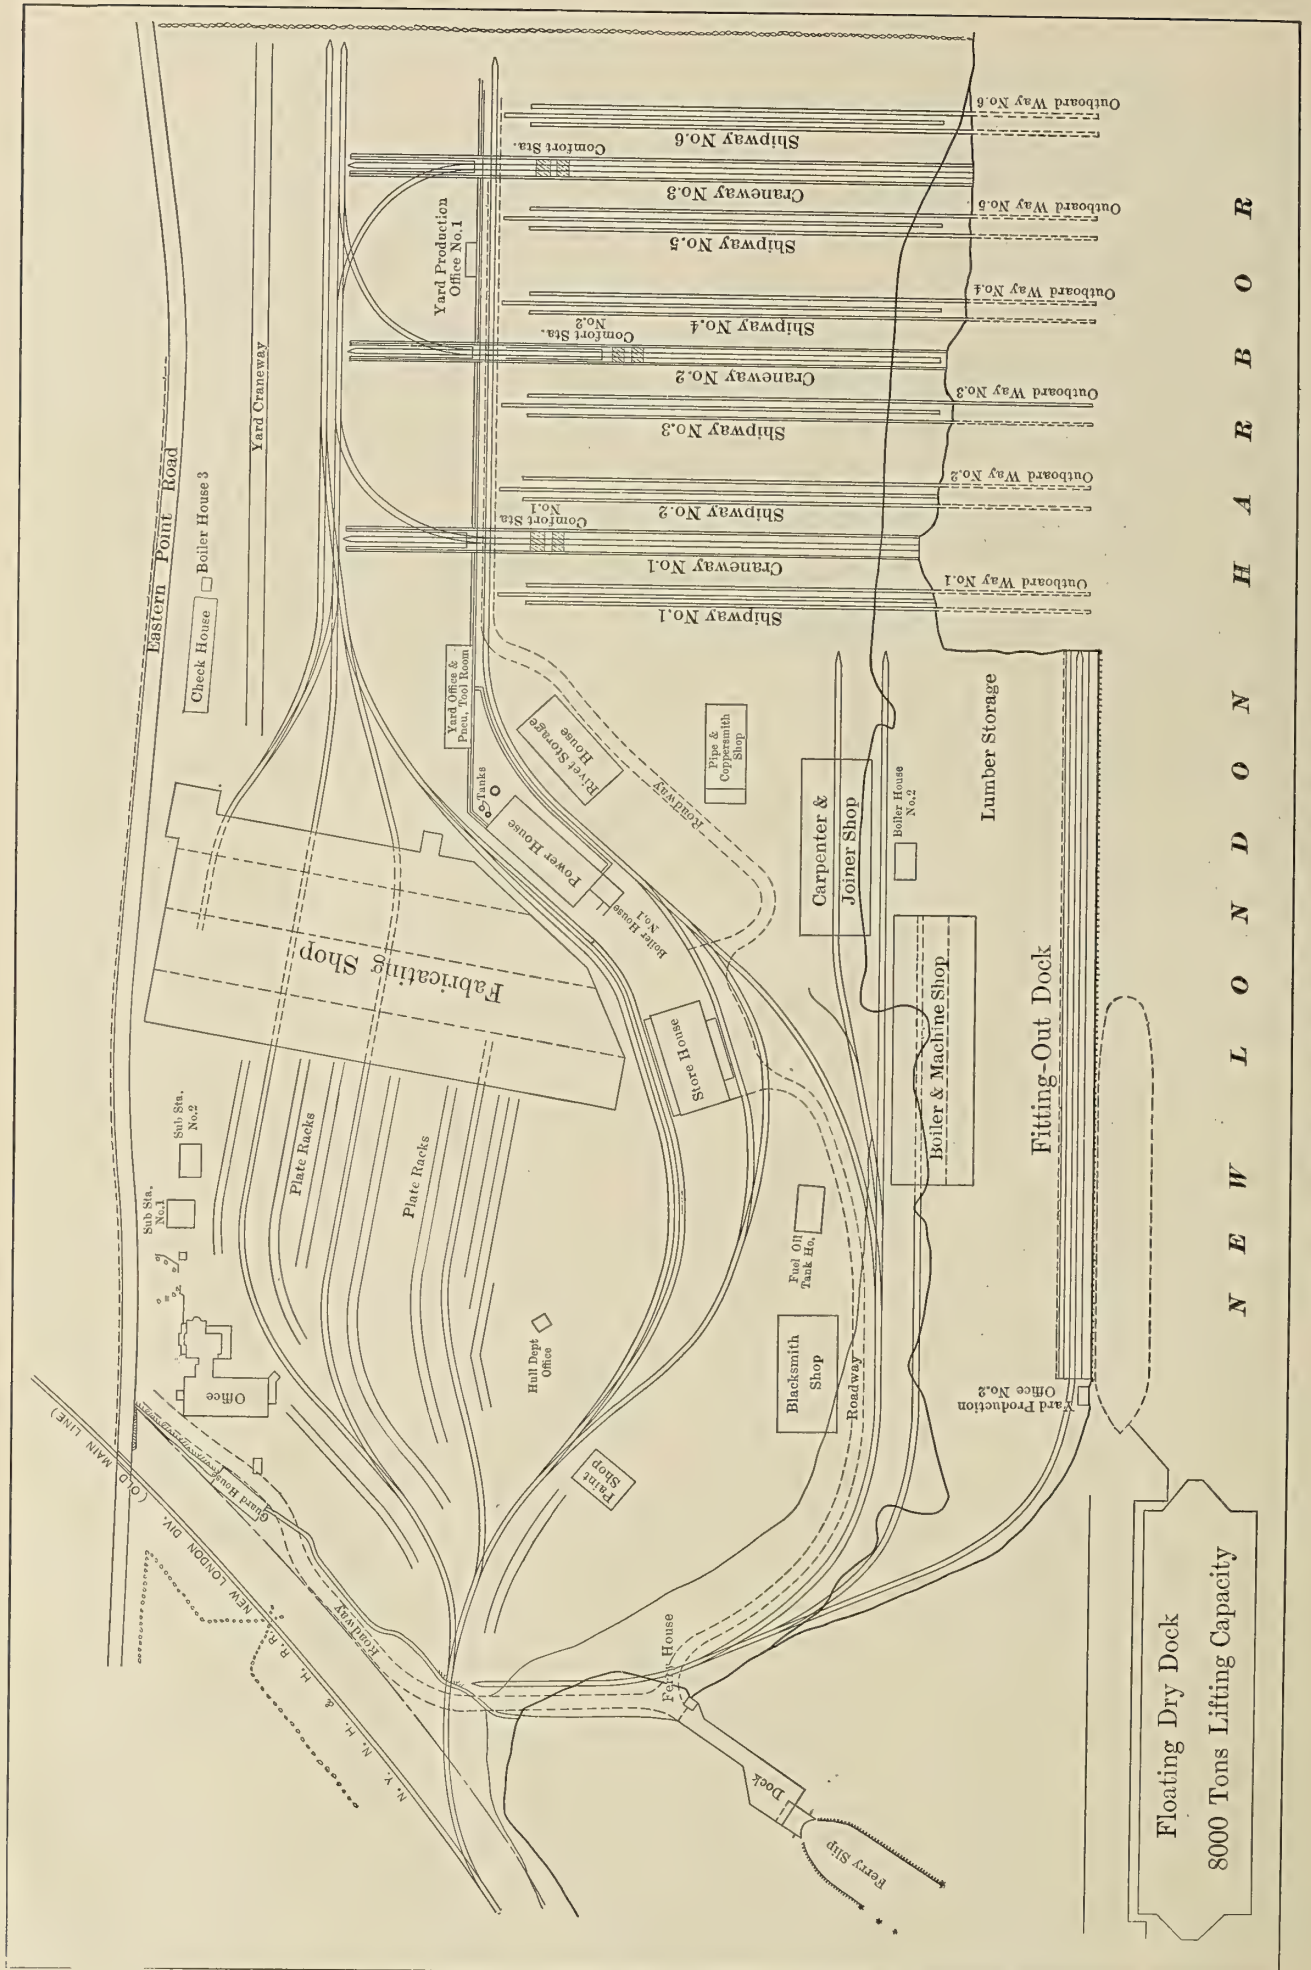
Plan Showing Layout of Groton Iron Works Shipyard
